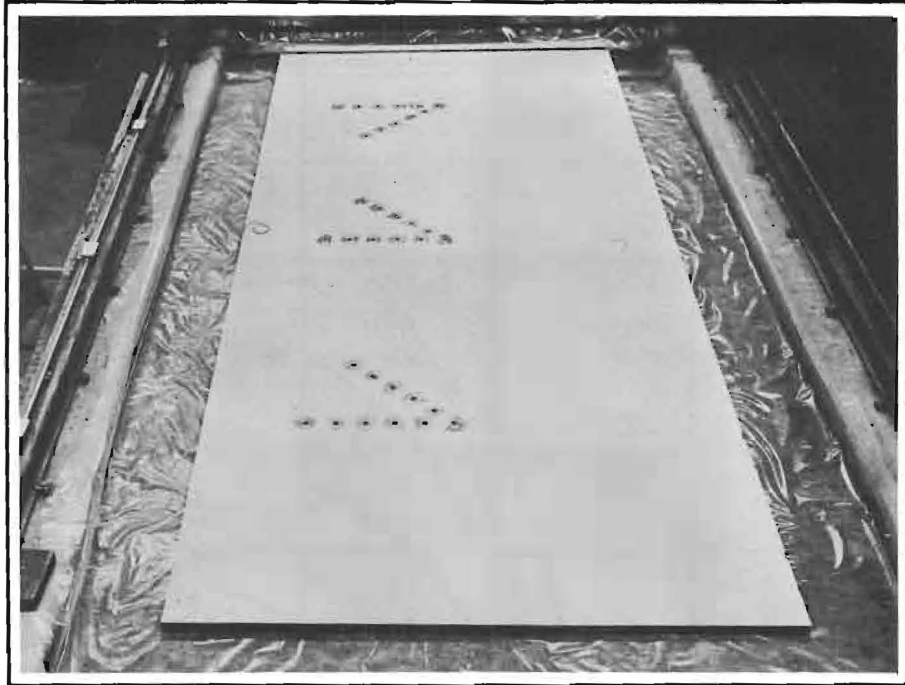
Arrangement of Type AX-5, SR-4 strain gage rosettes for static loading tests on Slab DM-7.
